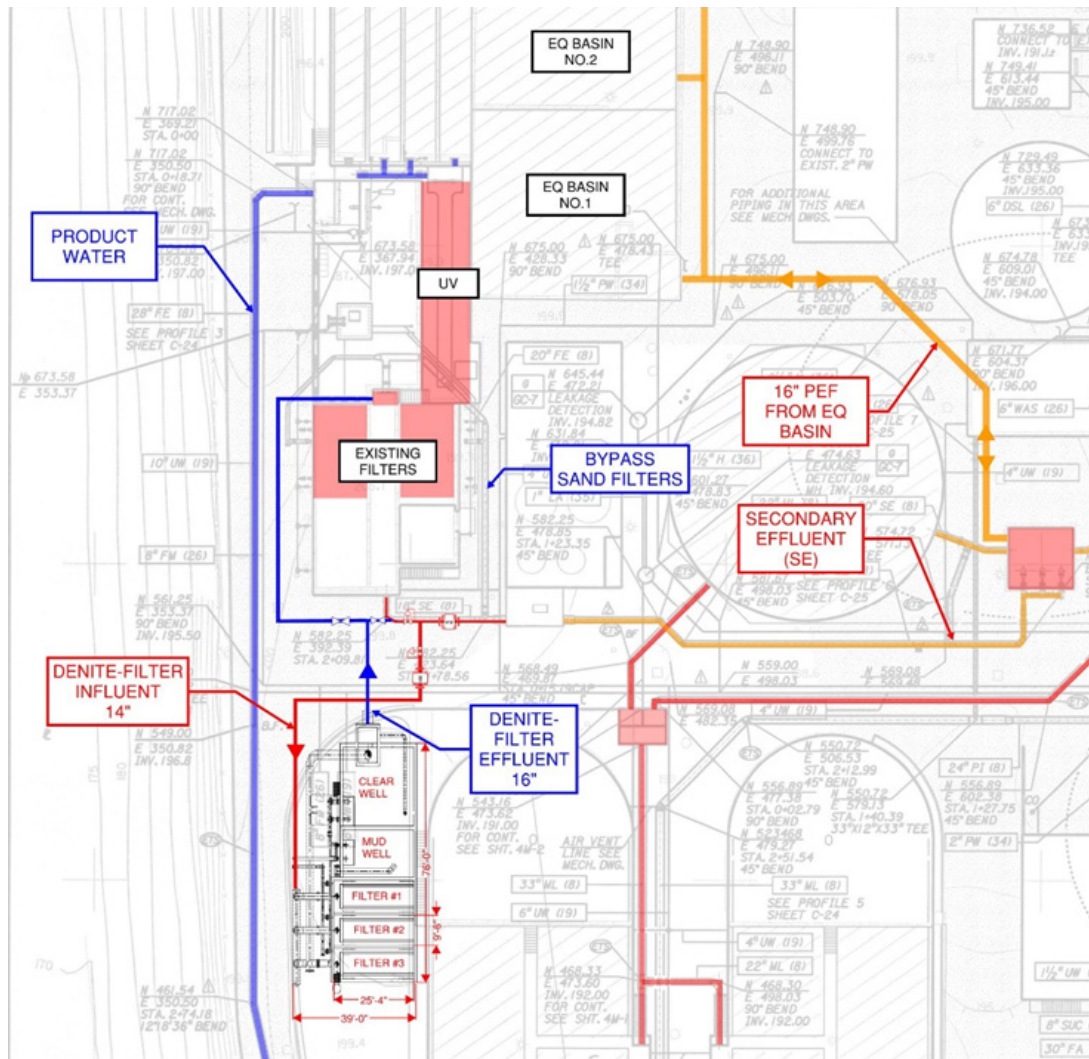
Preliminary Site Plan Arrangement for Alternative 1A
